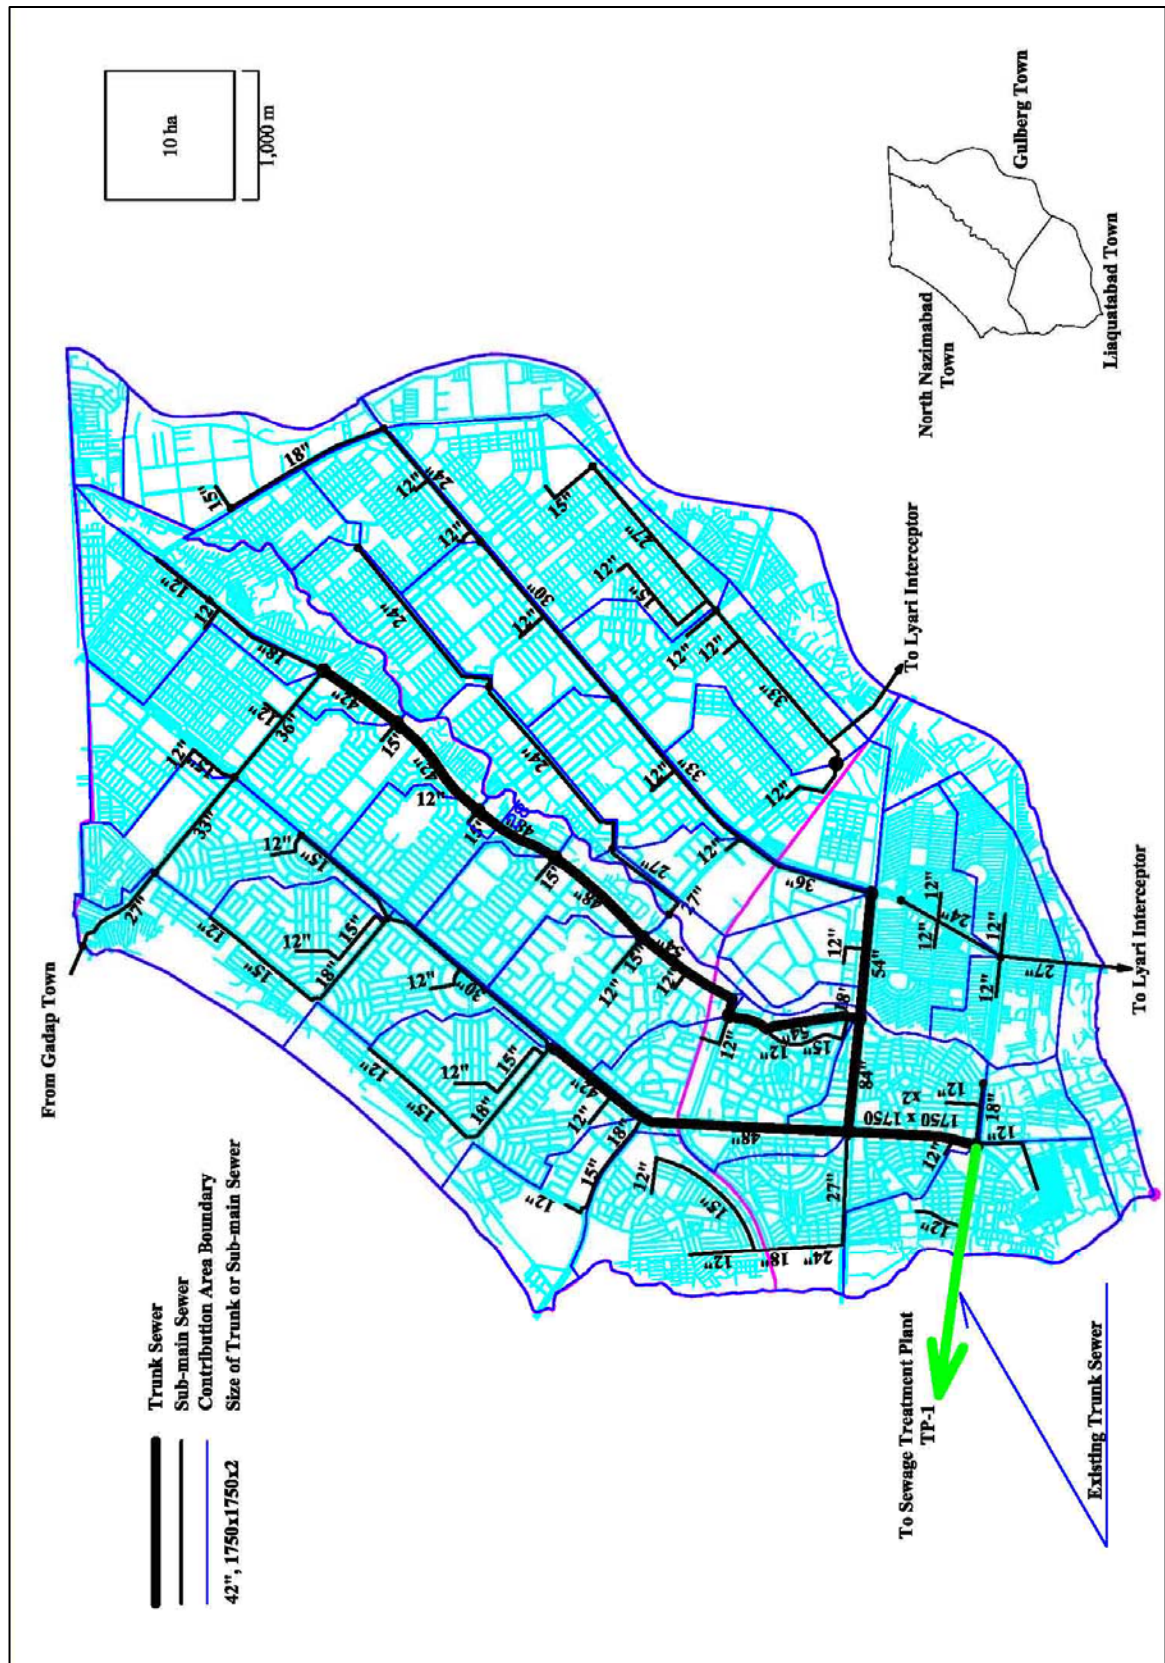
General Plan of Trunk and Sub-main Sewer
